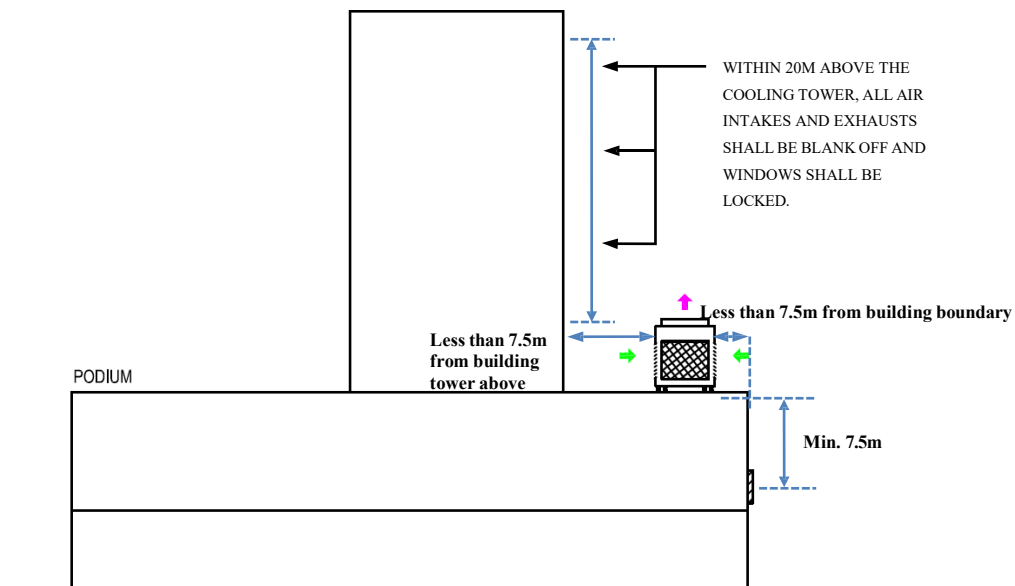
Cooling tower installed on podium (within 7.5m from its own building façade boundary/building tower above the podium) with separation from air intakes and exhausts and operable windows on its vertical building façade by minimum 7.5m below or 20m above. No public access is allowed for area within horizontal 7.5m from the cooling tower.
